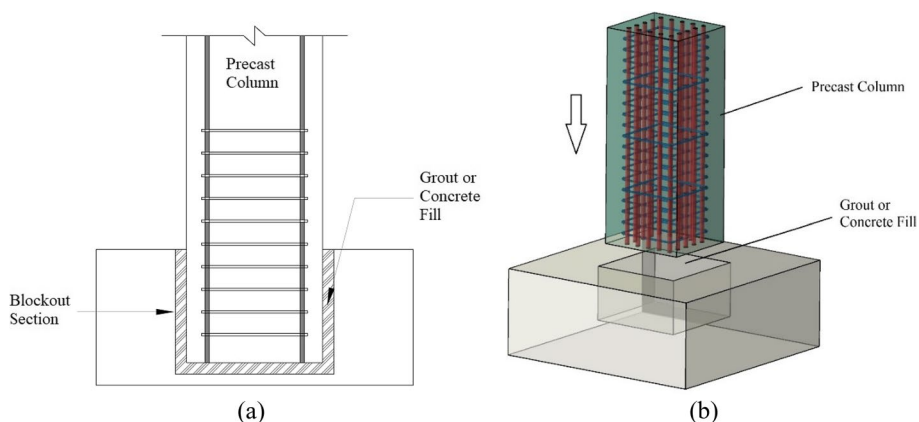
Socket connection: a Section b 3D view (© Munzer Hassan, ETS)
